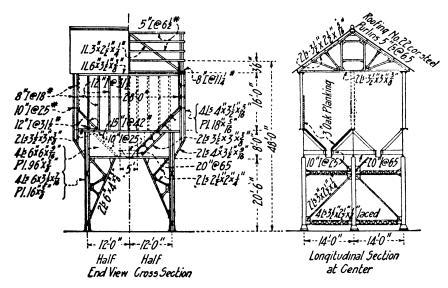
STEEL COAL BINS AT COKETON, W. VA.
